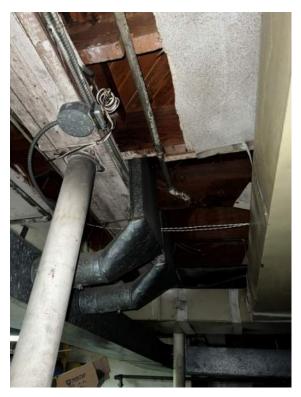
IMG_1248– Floor joists feature notches and holes. If configuration of interior walls, stairwells, finishes are altered and changing structural dead loads, and if interior live loads are altered based on occupancy reclassification, joists shall require to be evaluated by a structural engineer.
